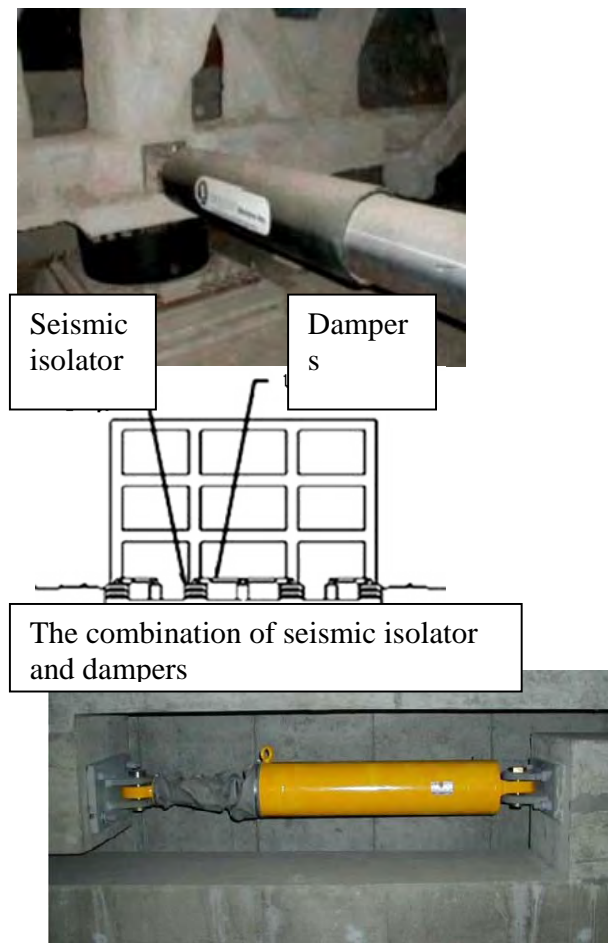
The connection of viscous dampers to the floor and foundation of the structures
